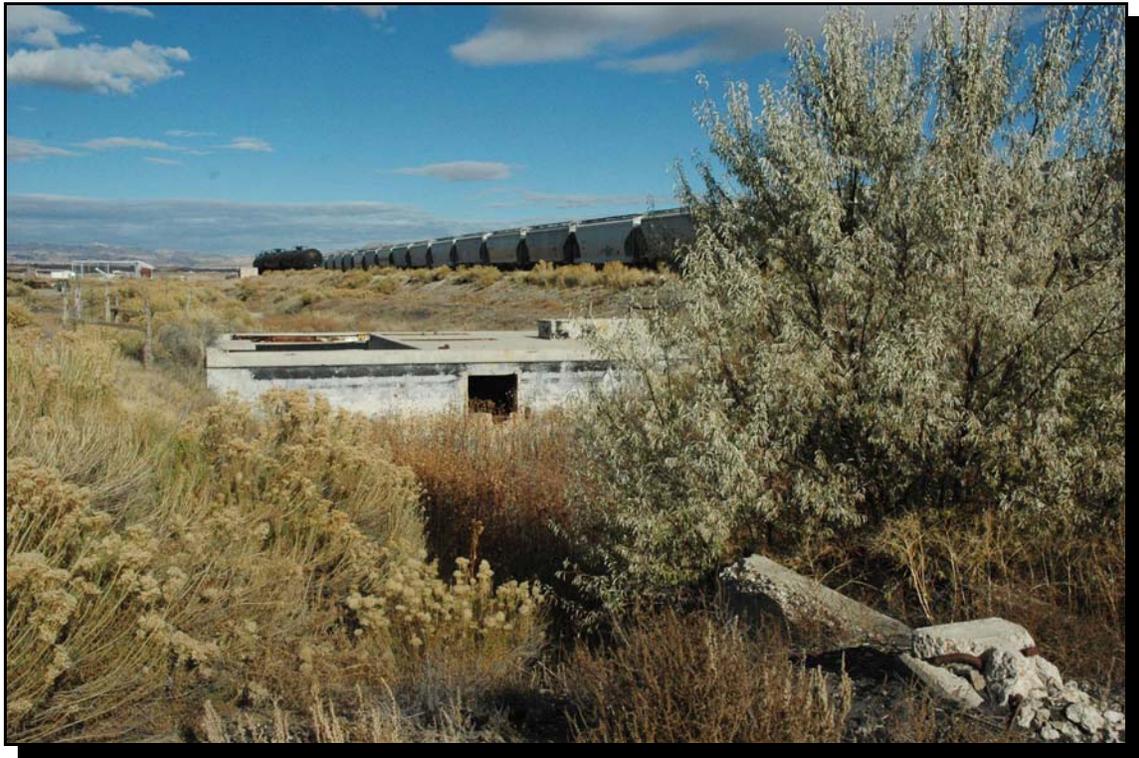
Photo B: Remaining Pipeline Foundation [see Demolition, Refuse Pipeline 01]
